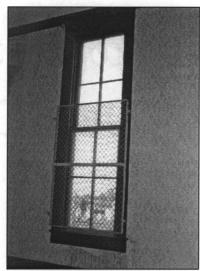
Window detail, view to the southwest (photo by Floyd Soenksen)
